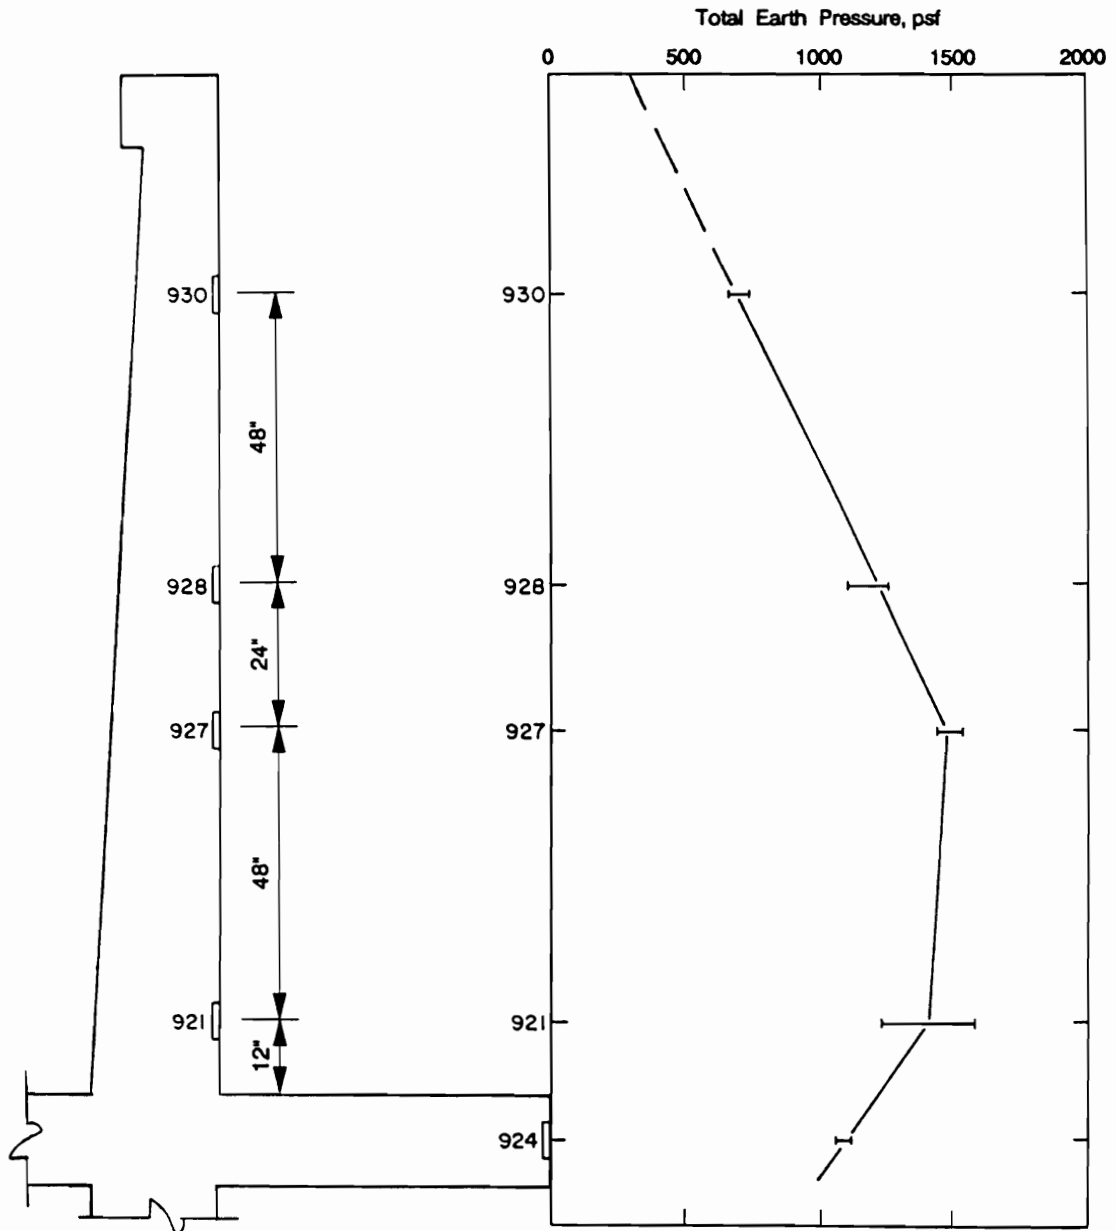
Measured Earth Pressures, Cantilever Retaining Wall, State Highway 288, Houston, Texas (Bruner, et al., 1983).
